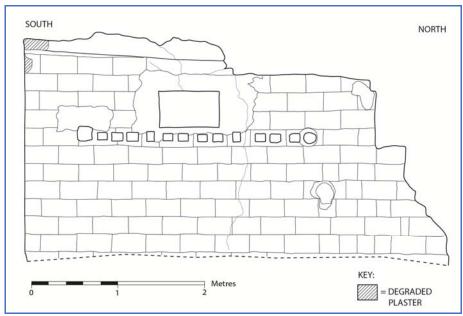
Elevation drawing of the west facing elevation of Structure 3.
